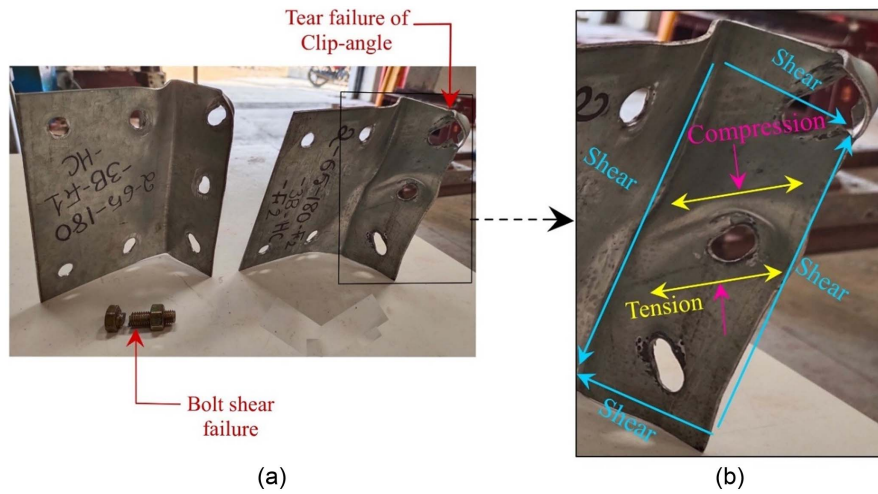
Failure modes in clip-angle: (a) bolt shear failure and CA tearing; and (b) failure mechanism of CA tearing.
